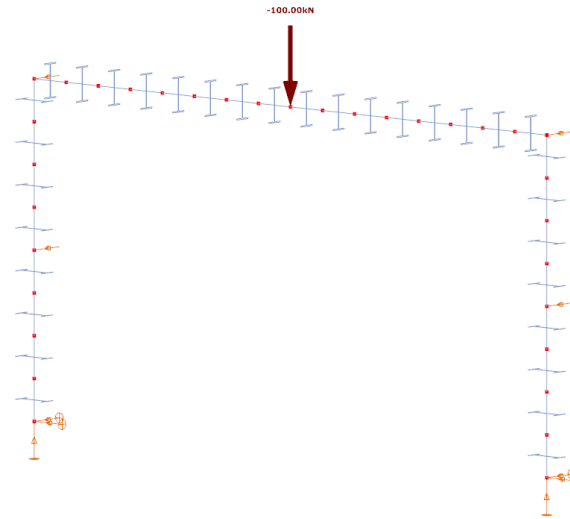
The Beam7 model of the simple frame structure (span:8000 mm; height: 4000 mm; flanges:200-12; web plate:388-8; $E=210.000 \text{ N/mm}^2$)
